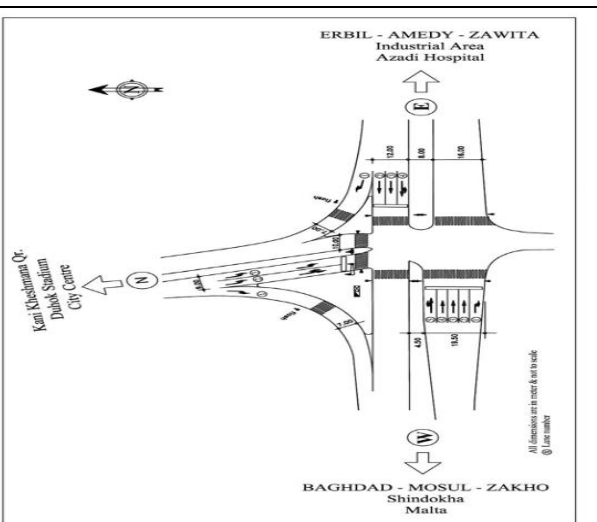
Peshmarga Intersection (P) Plan (Directorate of Traffic, Duhok City, 2009)
